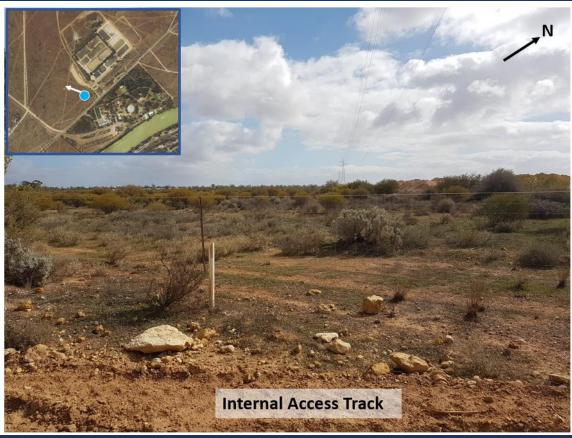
Morgan WTP and PS.1 site photo- facing northwest, standing at south-eastern perimeter of 'Area 1' (see site plans). Existing soil stockpile is visible beyond foreground vegetation (right hand side of image).
